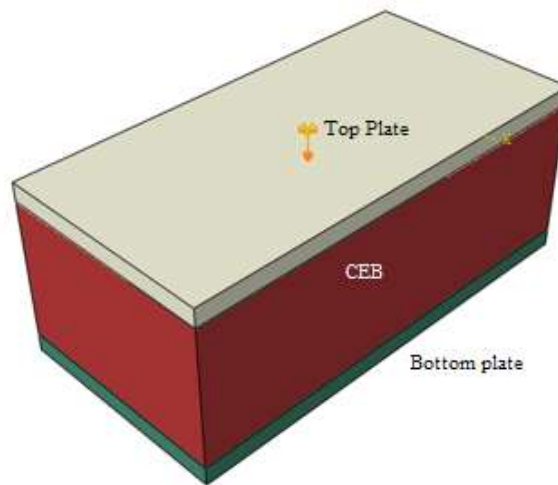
Assembly of Compressed Earth Block with Steel plate on top and bottom
